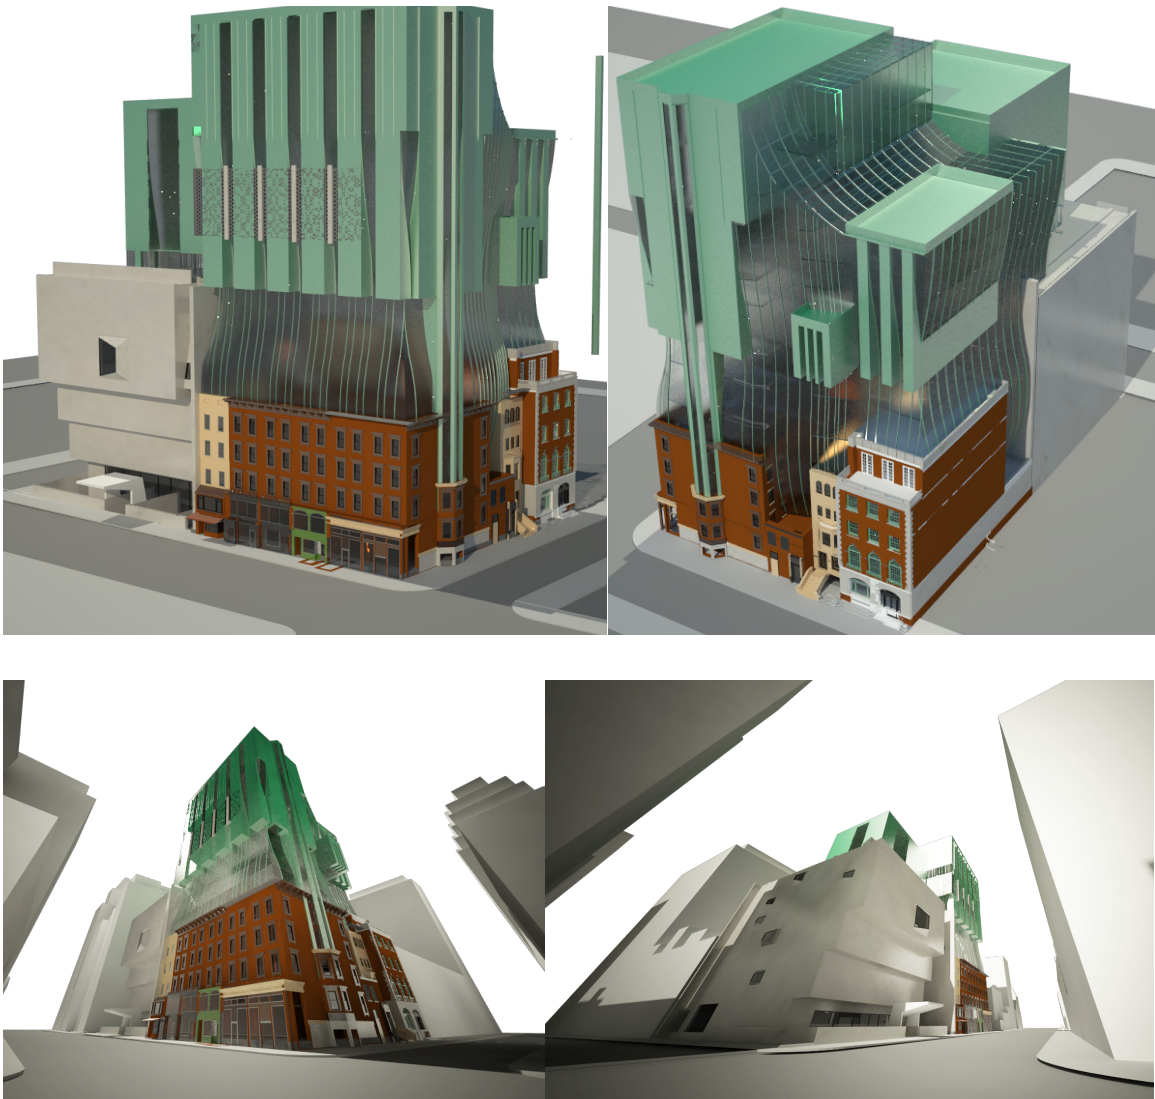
Rendering of the proposed addition looking from the corner of East 74th Street and Madison Avenue.
